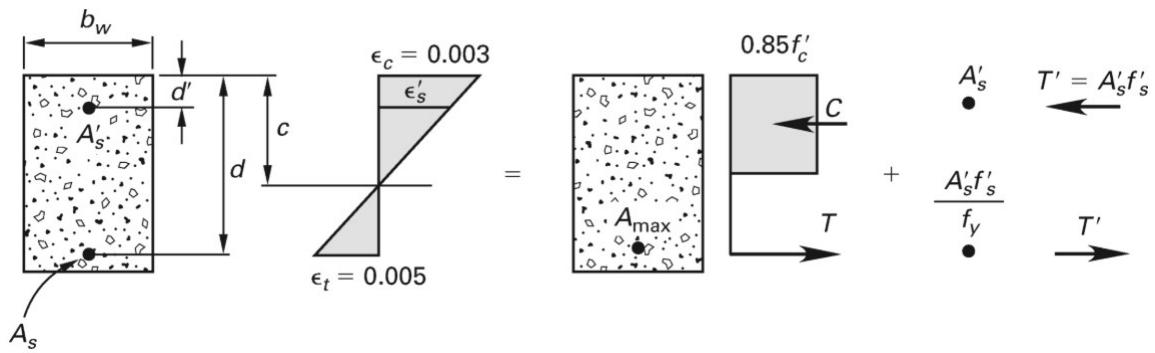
(Figure 2.1) Doubly Reinforced Cross Section Diagram [1]
